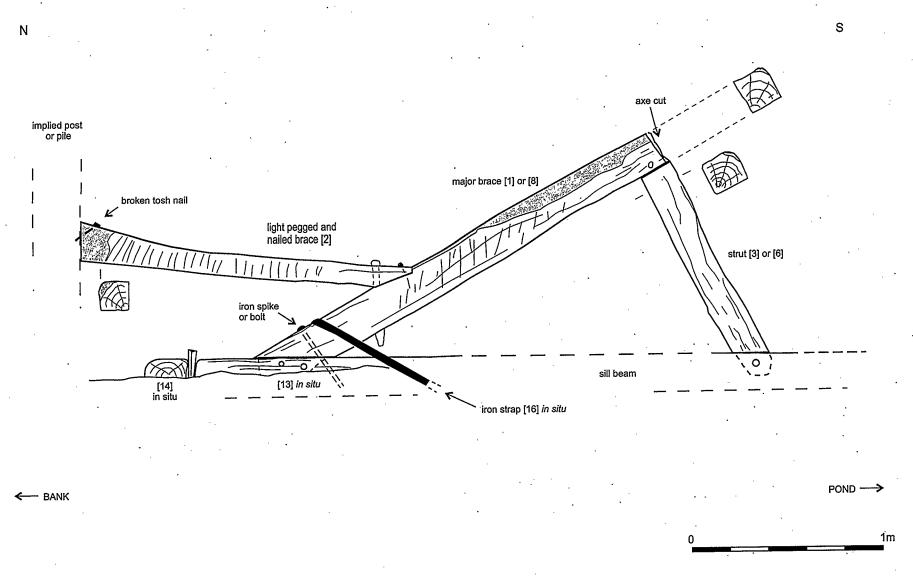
Reconstructed elevation of refitting timbers, forming 'Assembly A': part of a truss-like structure
